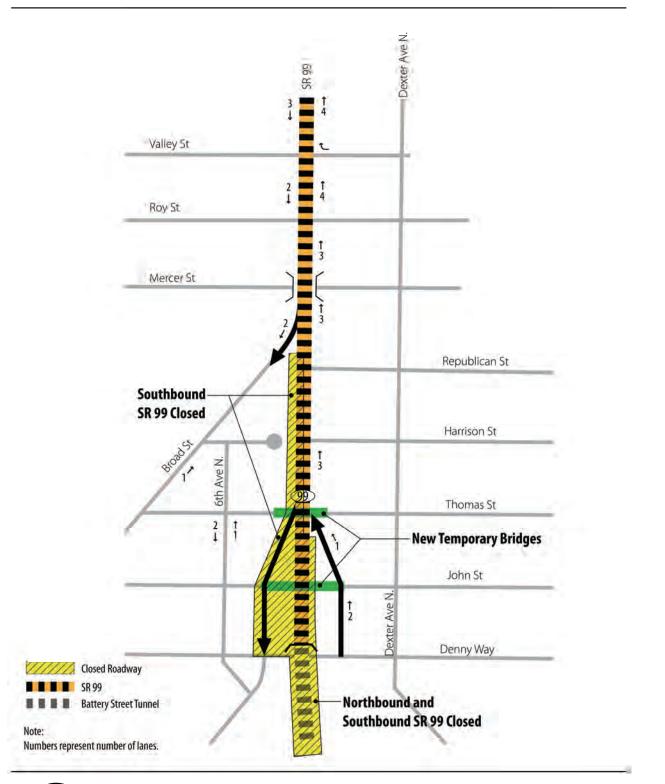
Cut-and-Cover Tunnel Alternative Traffic Stage 4 Roadway Configuration (North)
